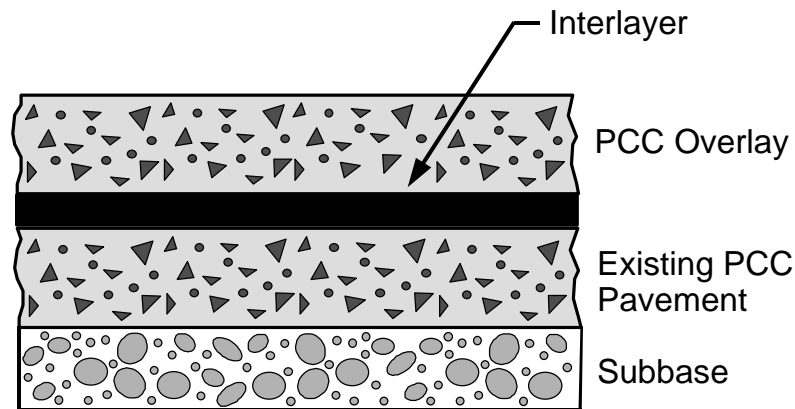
Unbonded rigid pavement overlay.⁽¹⁾
